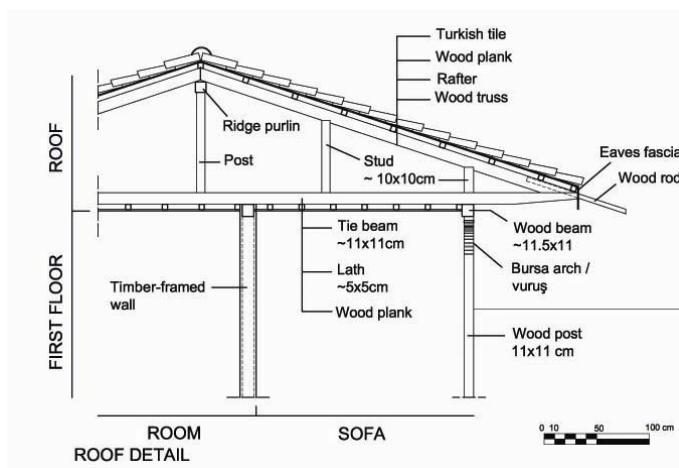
Pitched roof detail (Camcı St. 2nd dead end No: 34)
